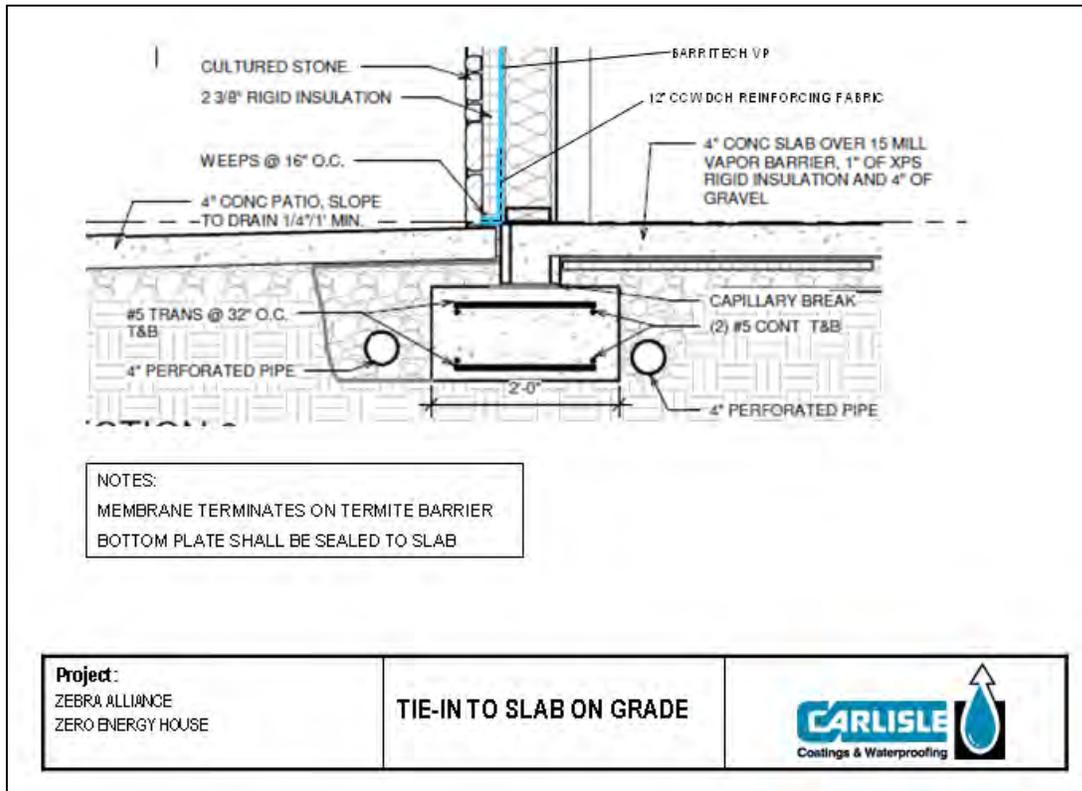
Manufacturer's Shop Drawing of Air Barrier Termination at Slab on Grade
